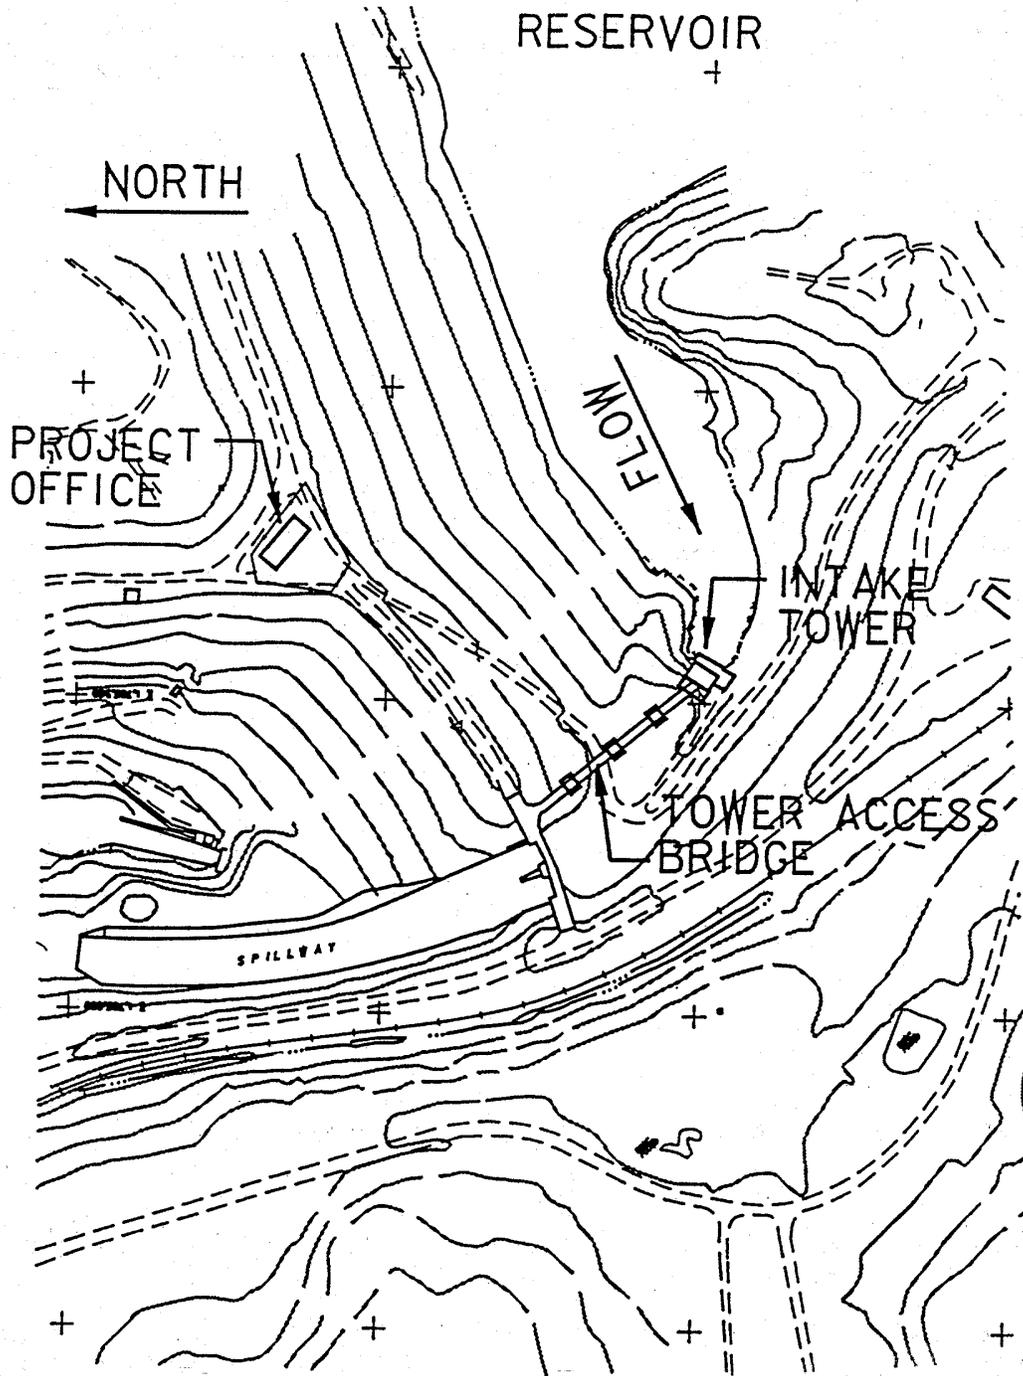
Plan view of Howard Hanson Dam and vicinity (Source: USACE 1998).
